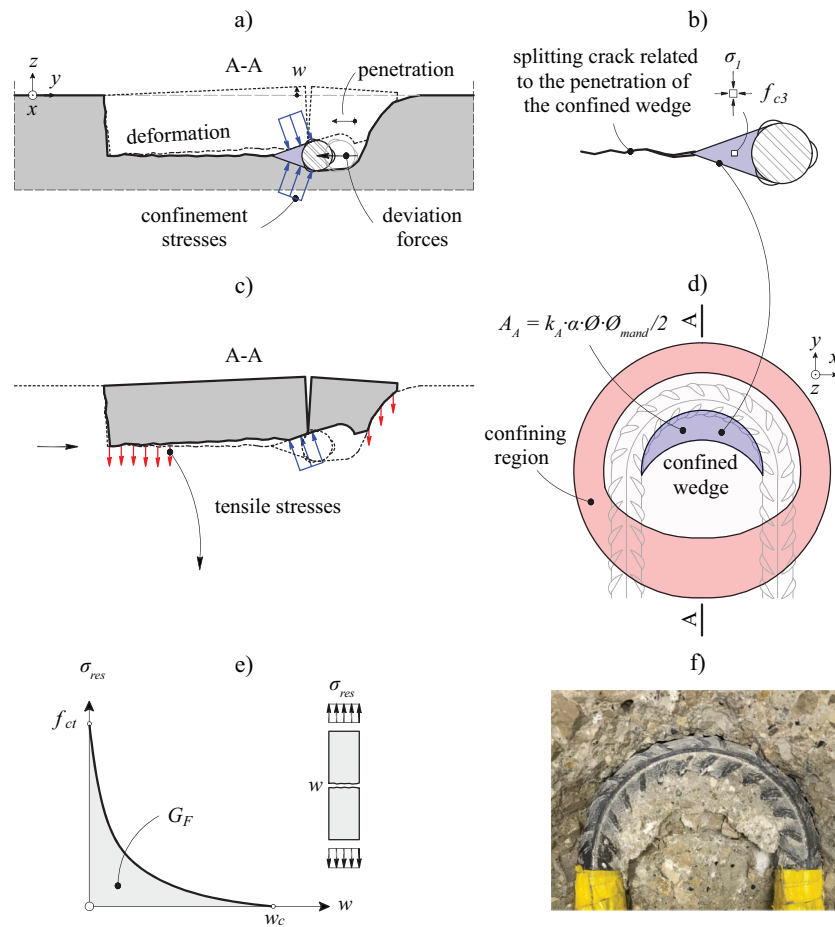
Mechanism of spalling failure: (a) concrete wedge, cover and kinematics; (b) concrete wedge shape; (c) equilibrium of forces; (d) confined wedge and confining region; (e) softening behaviour of cracked concrete; and (f) picture of the concrete wedge observed in test TM16 after cover removal.
